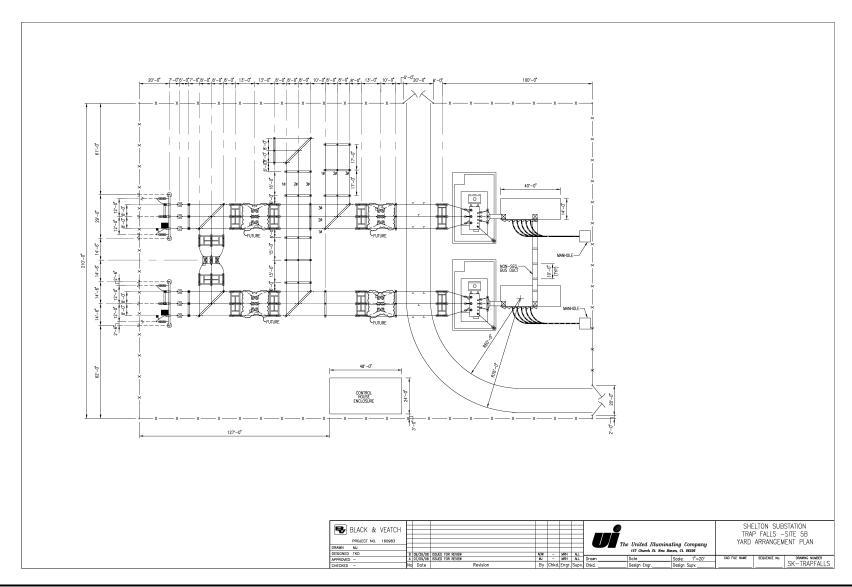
Proposed Substation Layout & Plot Plan at Site 1 - Trap Falls
